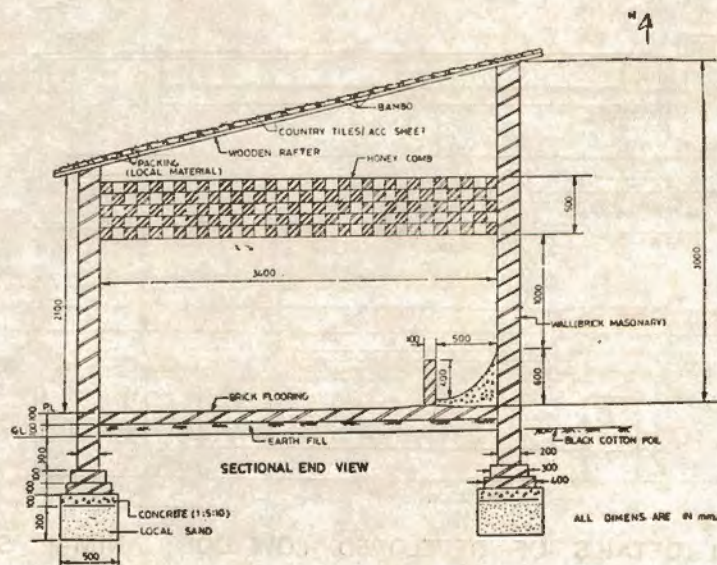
CROSS SECTIONAL VIEW OF DEVELOPED LOW COST ANIMAL SHED
